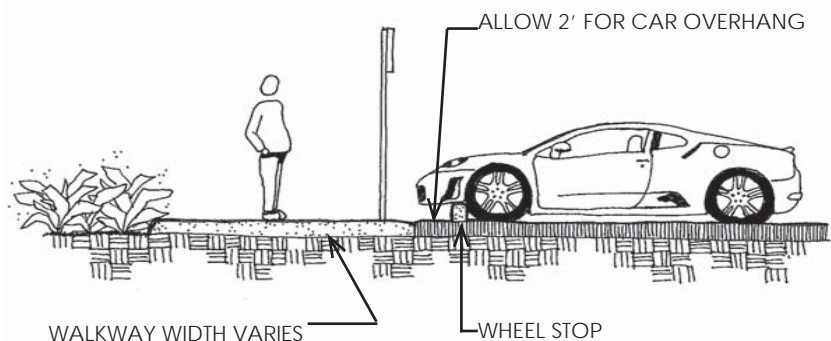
Parking Lot Curb - 0" Curb Face at ADA Parking Stalls
